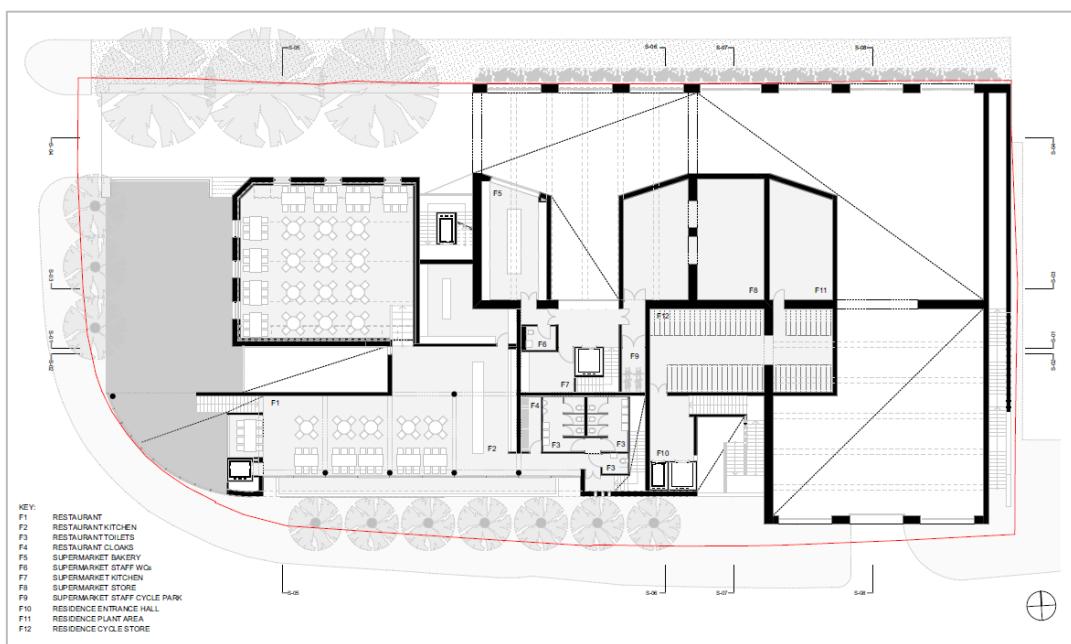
Proposed First Floor Plan – Sutherland Hussey Harris and NArch London (Sept 2019)
